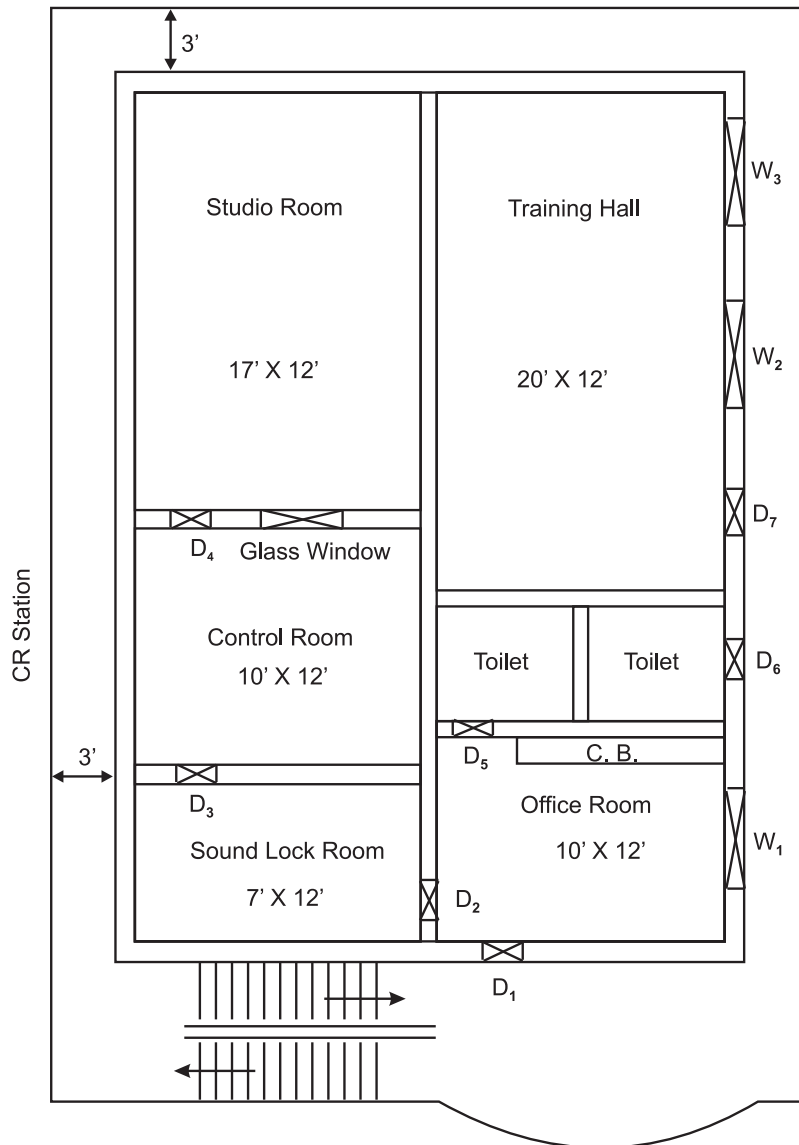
A Sample floor plan of a CRS (Courtesy the author)
